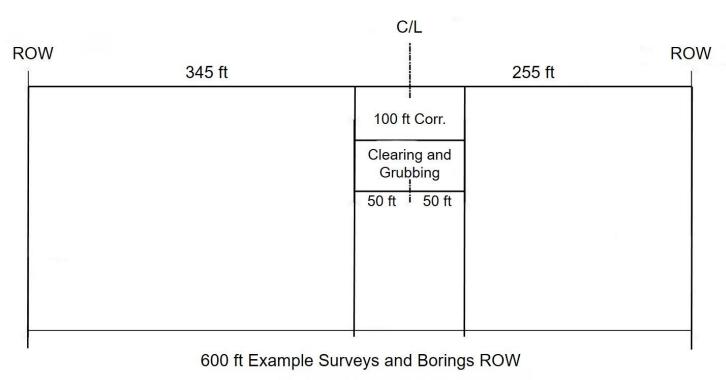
Plan view drawing of a typical ROW for the Proposed Action.
